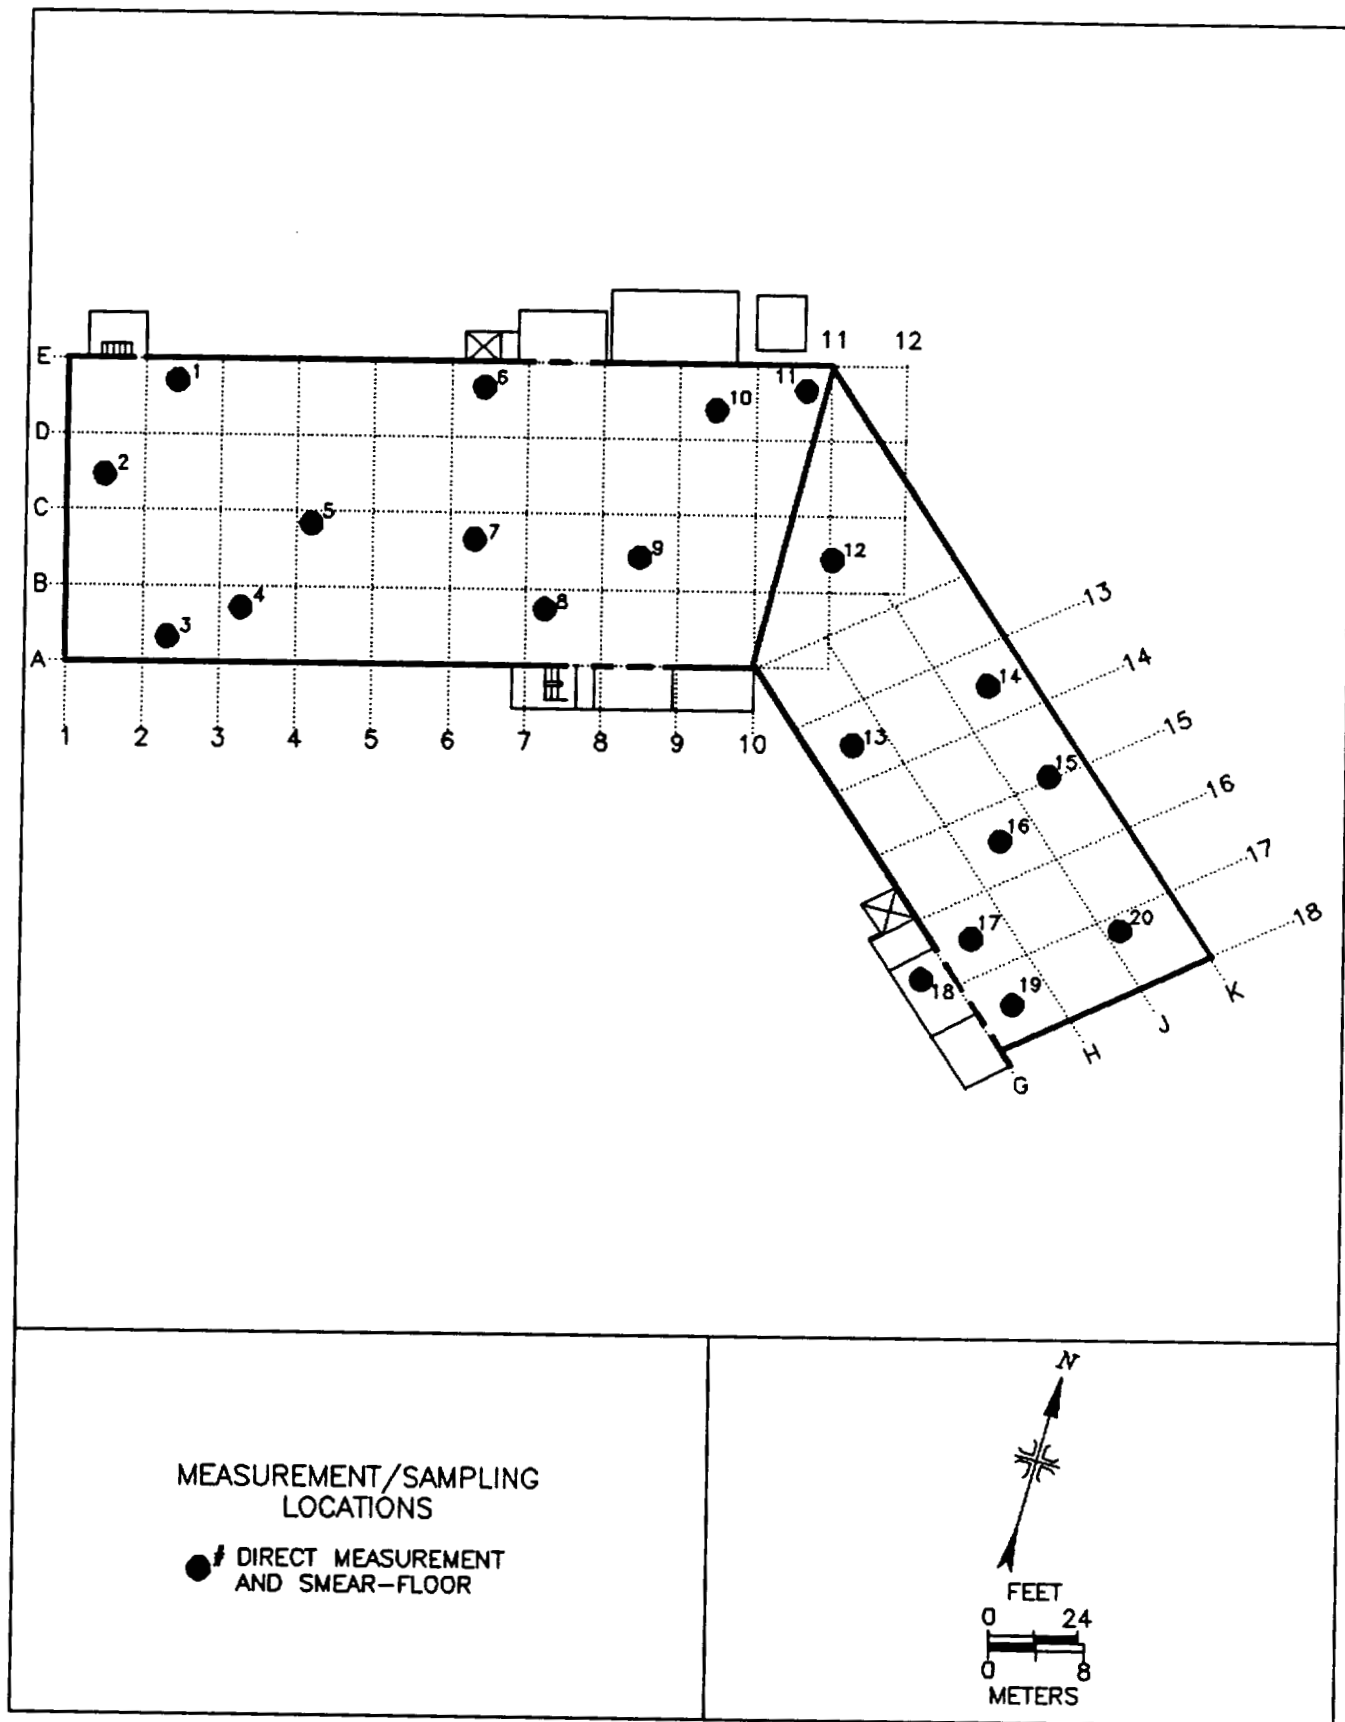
Building 8, Third Floor — Measurement and Sampling Locations
